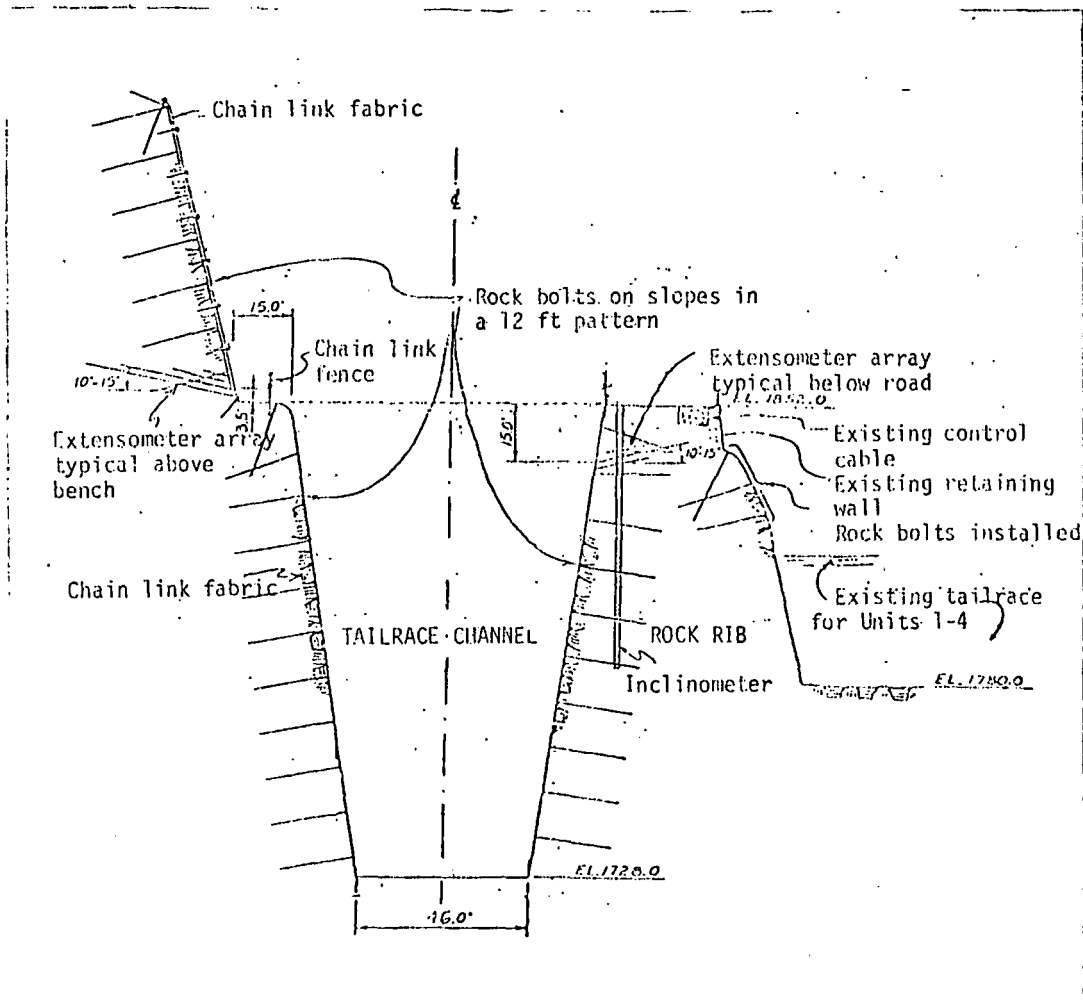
Rock Rib Reinforcement and Instrumentation
